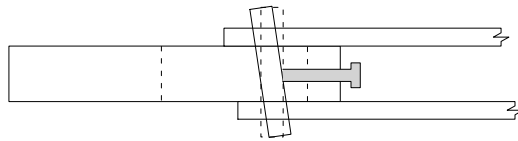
Welded Brace Connection Detail
